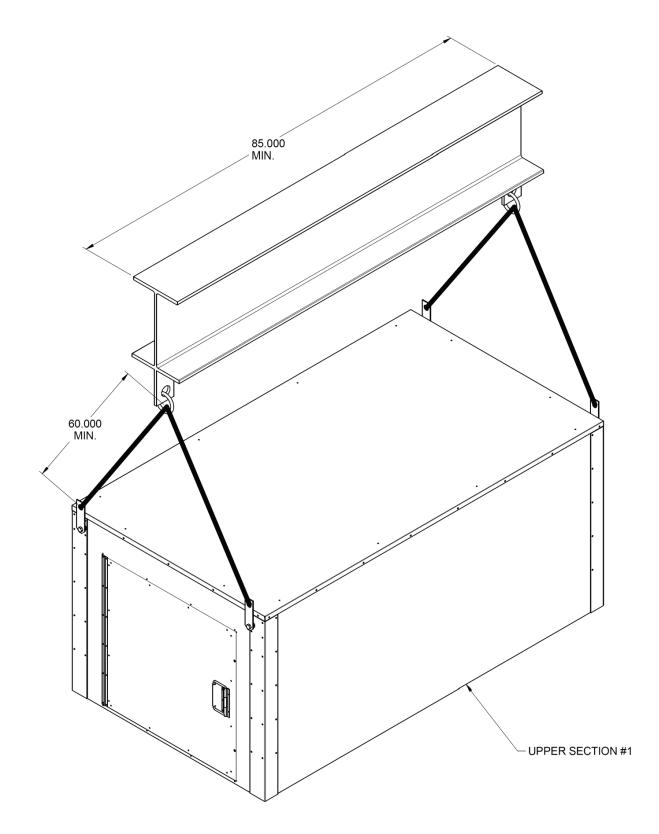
Two Piece Single Unit Fan Section Lifting Details
